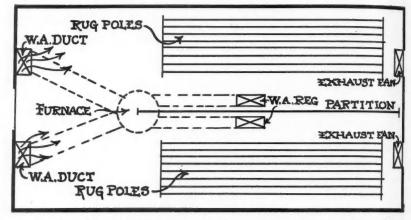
Plan of a Typical Carpet Drying Room, Moist Air Being Eliminated by a Warm Air Furnace and Exhaust Fans.
